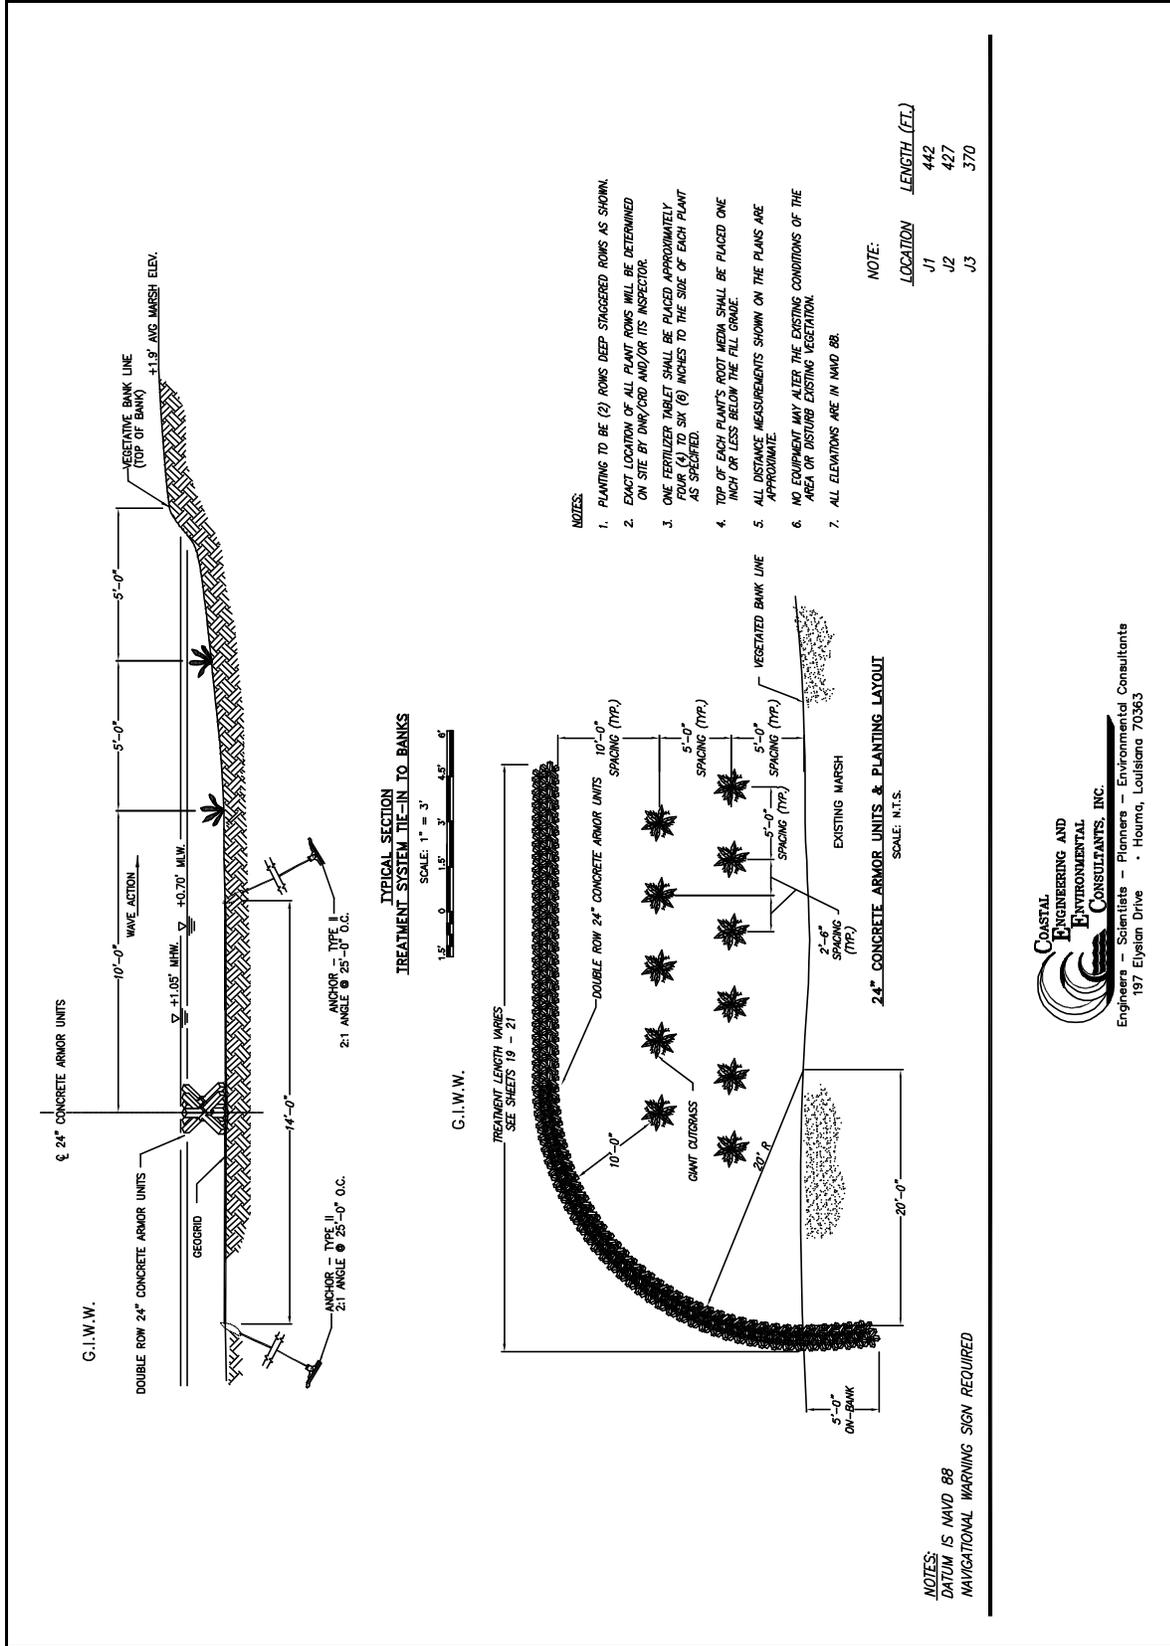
Typical section views of A-Jacks® with planting layout (treatment J) for (TE-41) Mandalay Bank Protection (Demo) Project (from CEEC 2001, not to scale).
